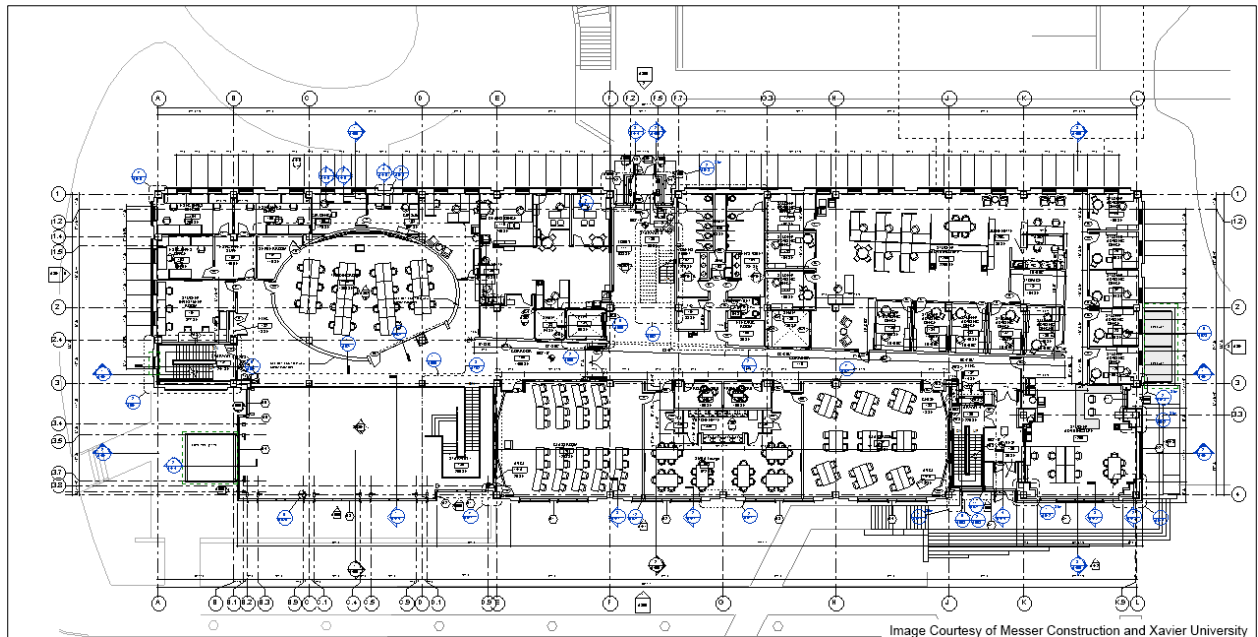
Floor plan in a construction BIM Model with annotation and dimensions. Refer to section 2 for more information.
